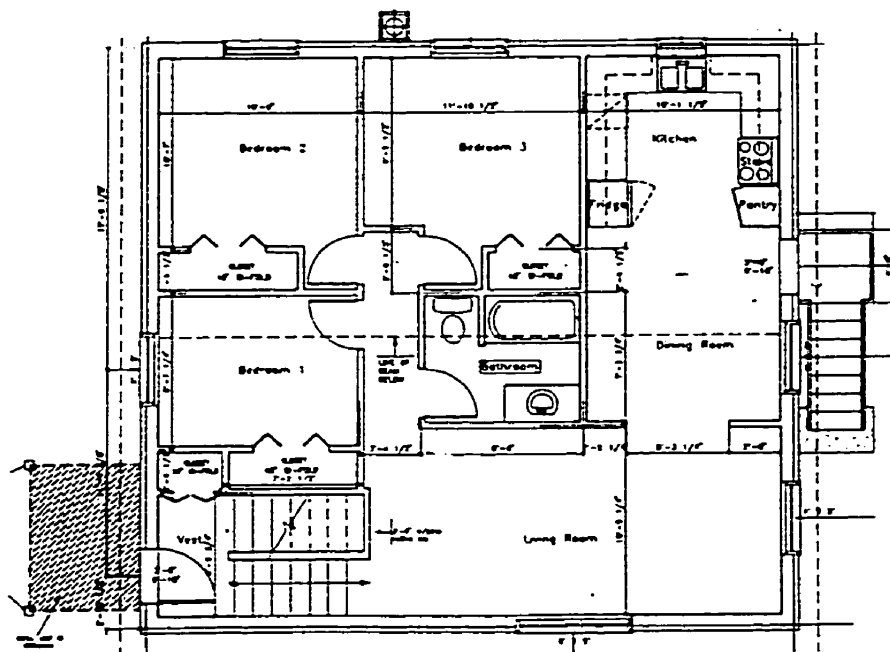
Ground floor, original layout (Inuit House, 1996)
